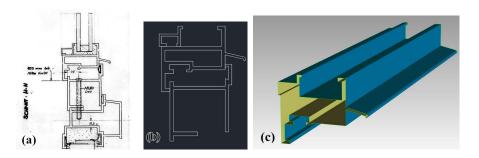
(a) Vertical detail section, plan #260066/2, Archive of Josef Gartner GmbH, Gundelfingen/Donau. (b) The plan was traced and reduced in CAD software to generate our GT (c) The resulting GT in 3D.
